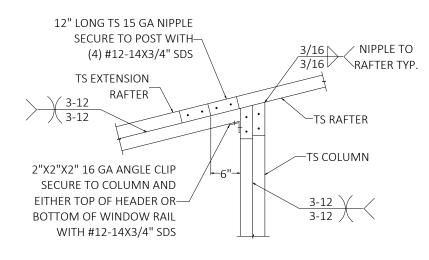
A SIDE EXTENSION RAFTER/COLUMN CONNECTION FOR RAFTER SPANS LESS THAN 12'-0"
